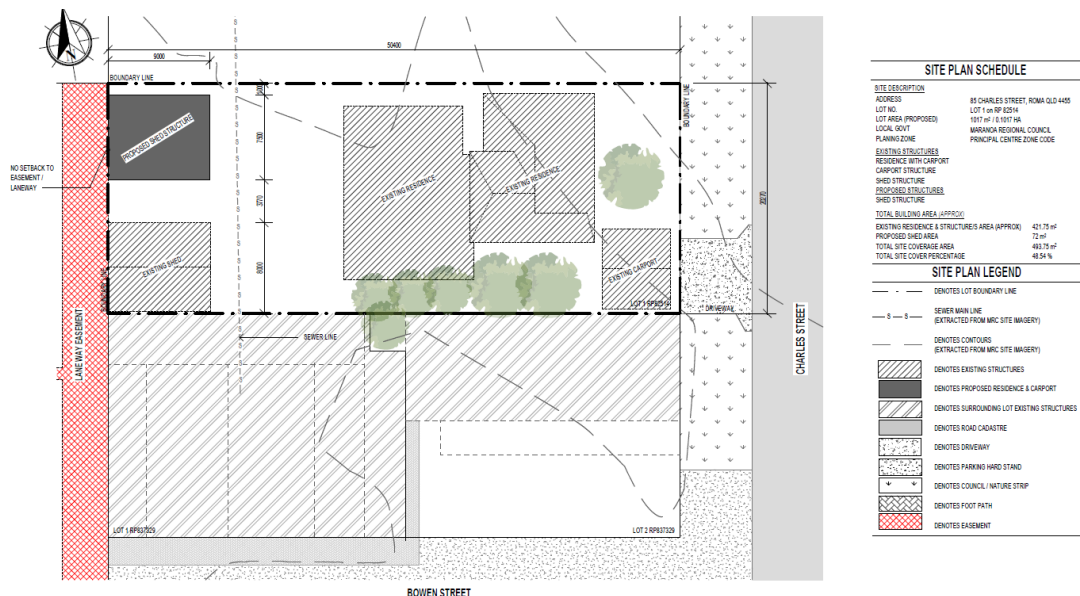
Proposed Site Plan (Source: Brandon & Associates)
